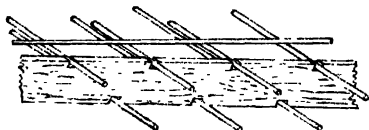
TEMPLATE BOARD ASSISTS IN FIXING STEEL BARS
